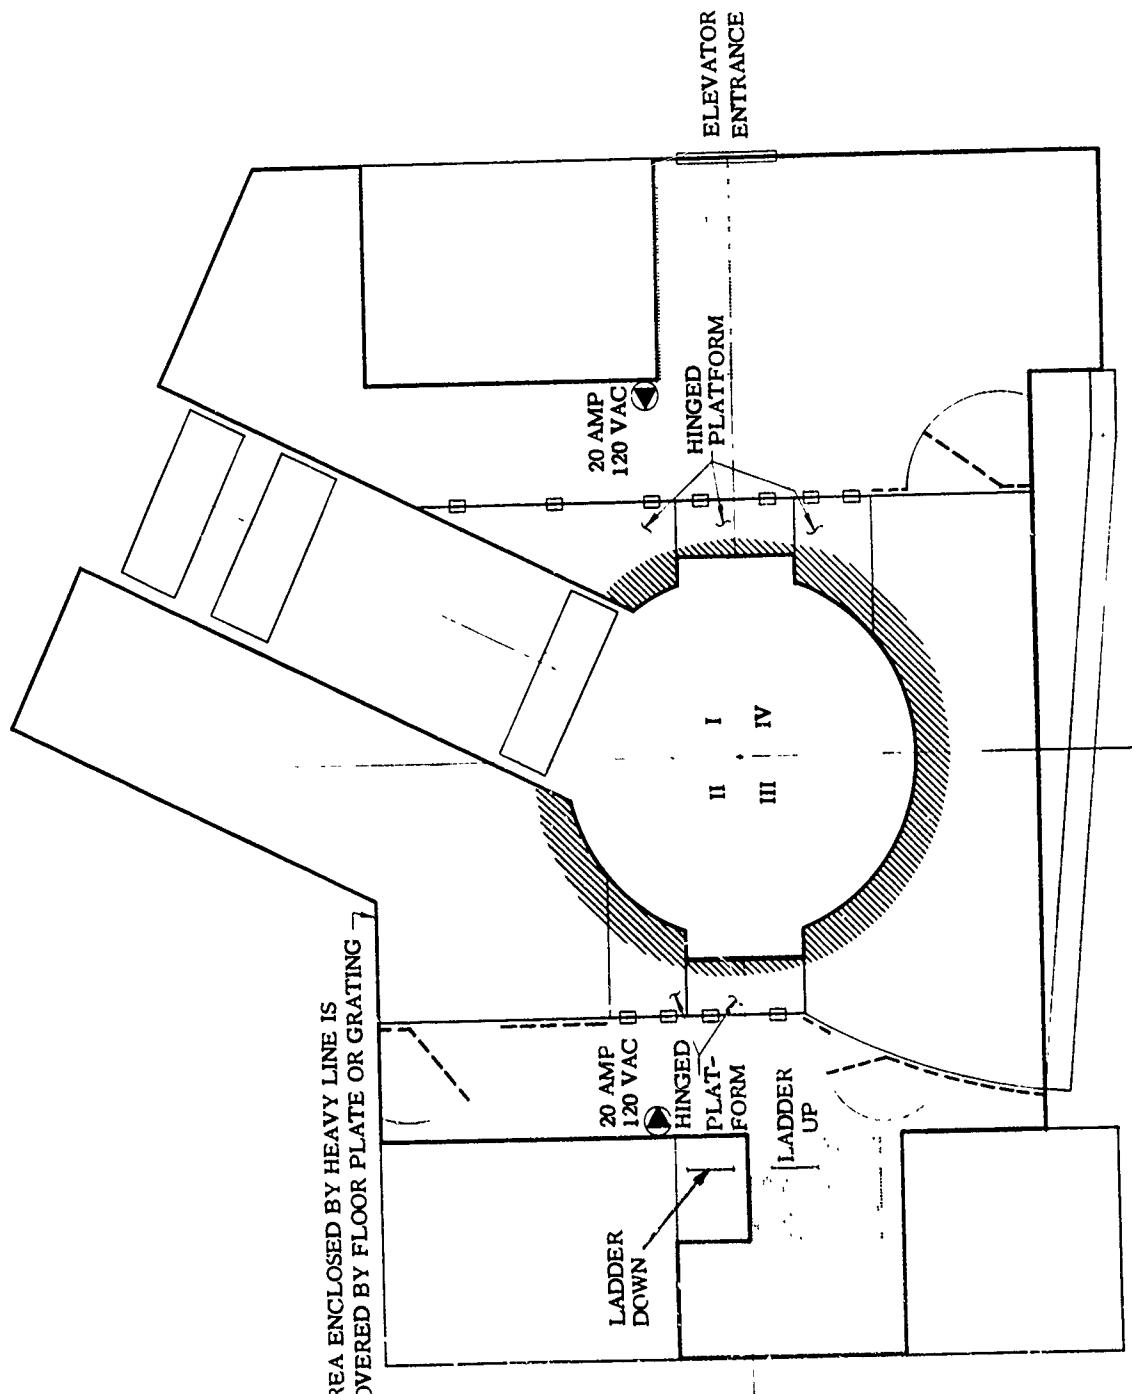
Usable Floor Space Areas, Tower Station 84
